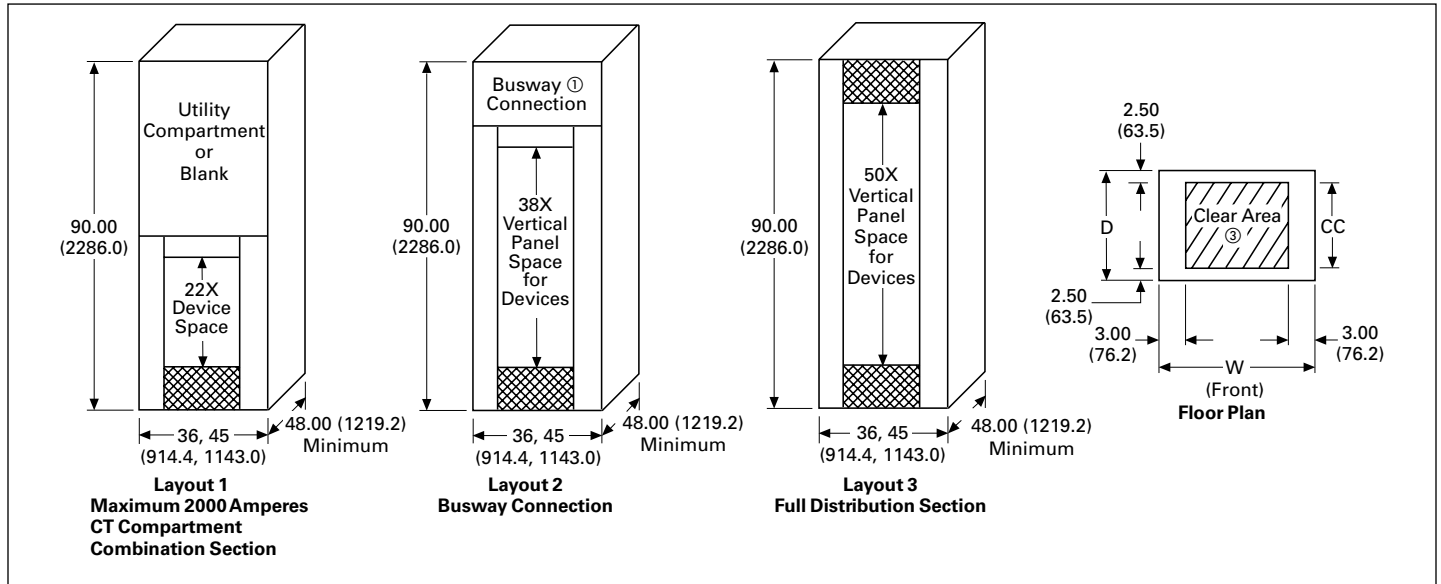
Distribution Section Layout—Dimensions in Inches (mm)
